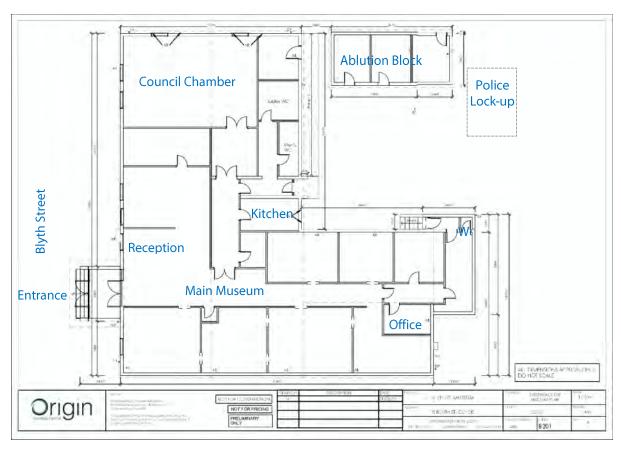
Plan of the Blyth Street Museum (NTS). Plan: Origin Consultants Ltd.
